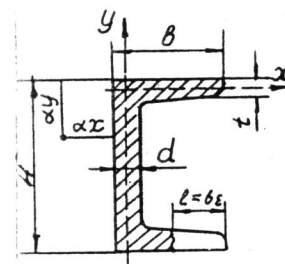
Standard beam's cross-section of channel profiles with an edge crack
